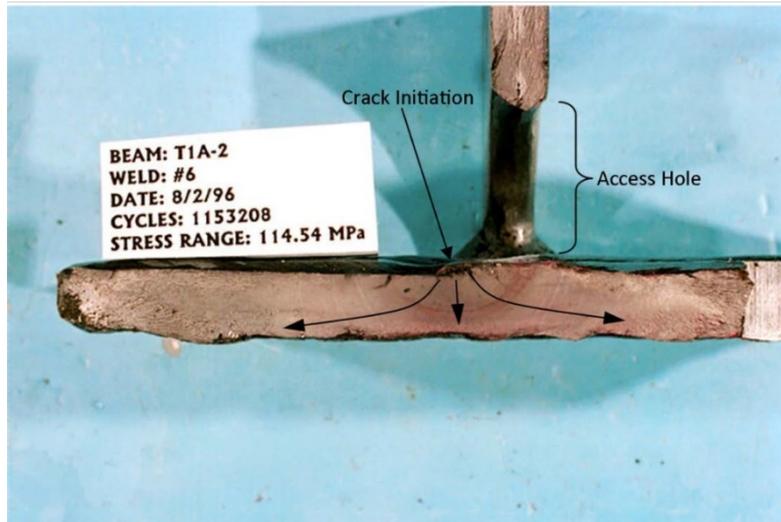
Typical fatigue crack across a repaired flange butt weld (FHWA-IF-13-020)
